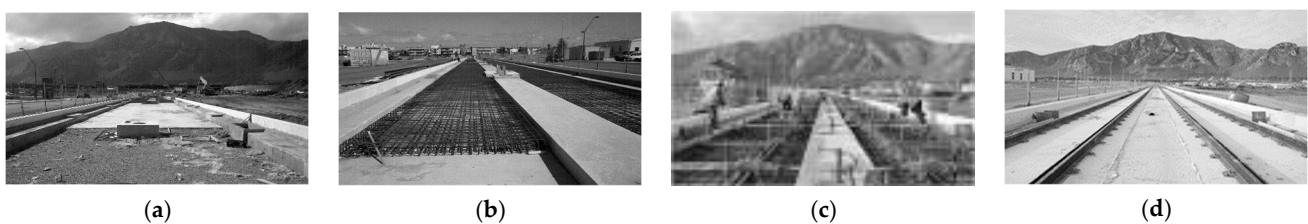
Construction phases of the tramway track on the analysed urban roads. (a) casting of a lean concrete layer and curb construction; (b) laying of steel reinforcement bars; (c) laying of the flat framework; (d) casting of the concrete slab and paving.
